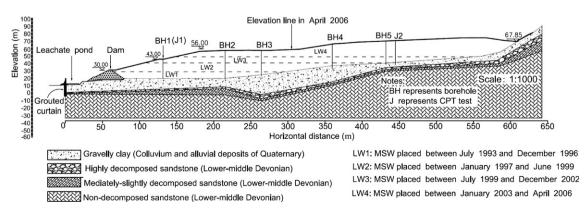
Cross-section of the existing landfill in Suzhou of China and layout of boreholes and CPT locations.
